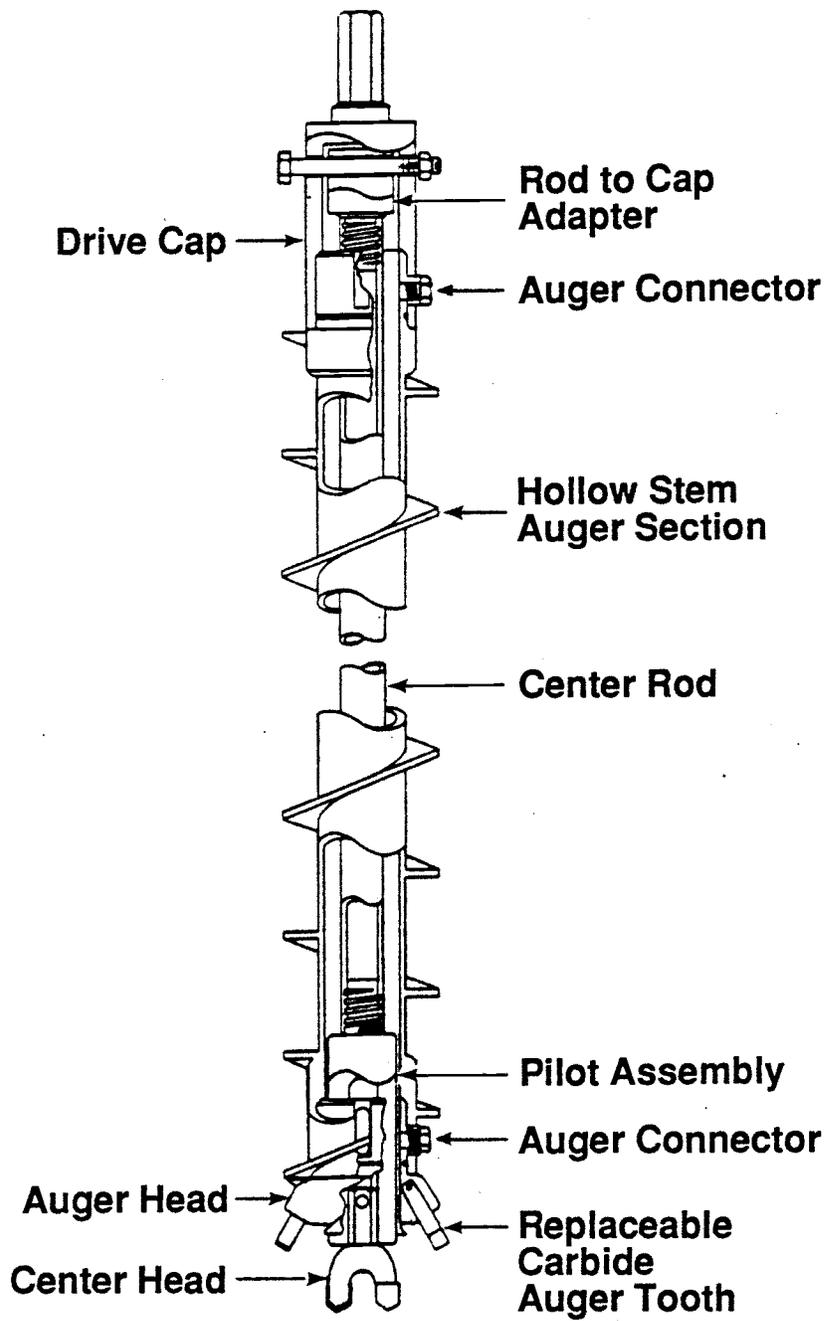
Hollow stem auger components (after Central Mine Equipment Co.)
